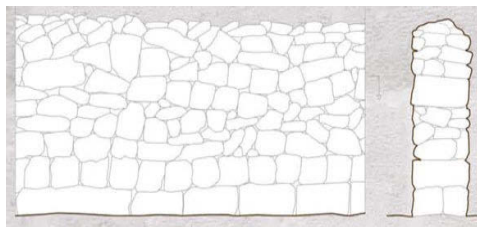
Dry stone wall with selected shapeless stones and ash-lars (Source: Caleca, 2018)
